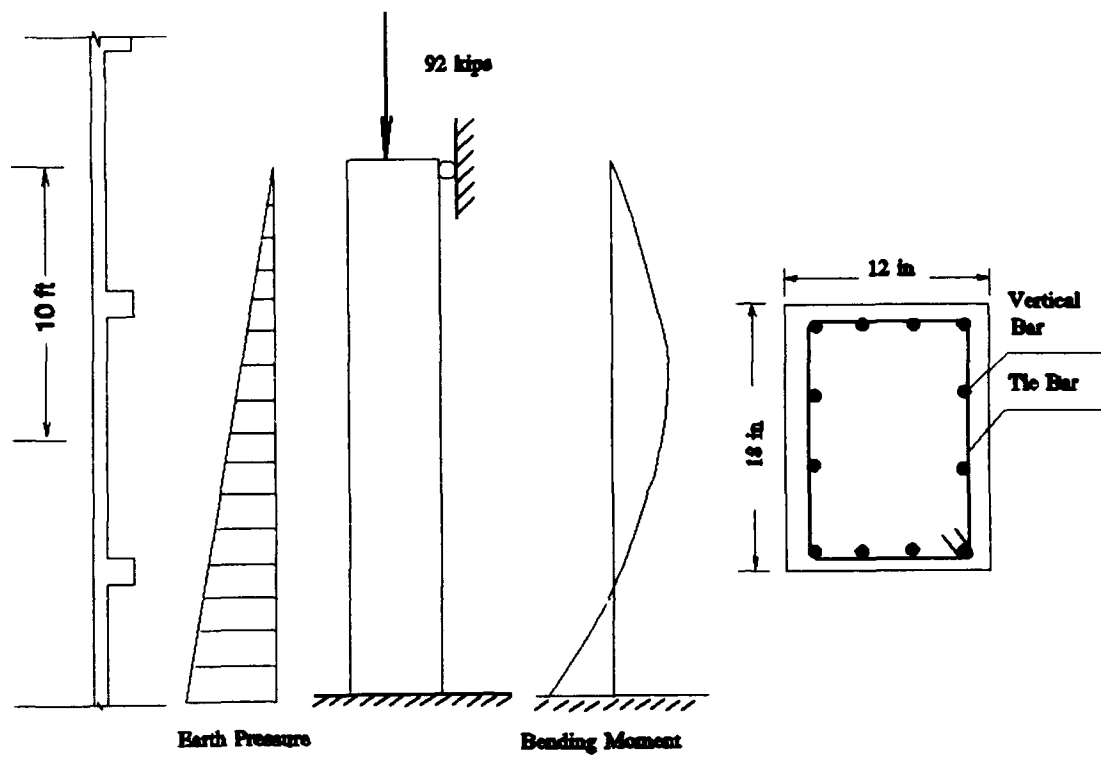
A MODEL FOR THE STRENGTHENING COLUMN OF THE WALL
